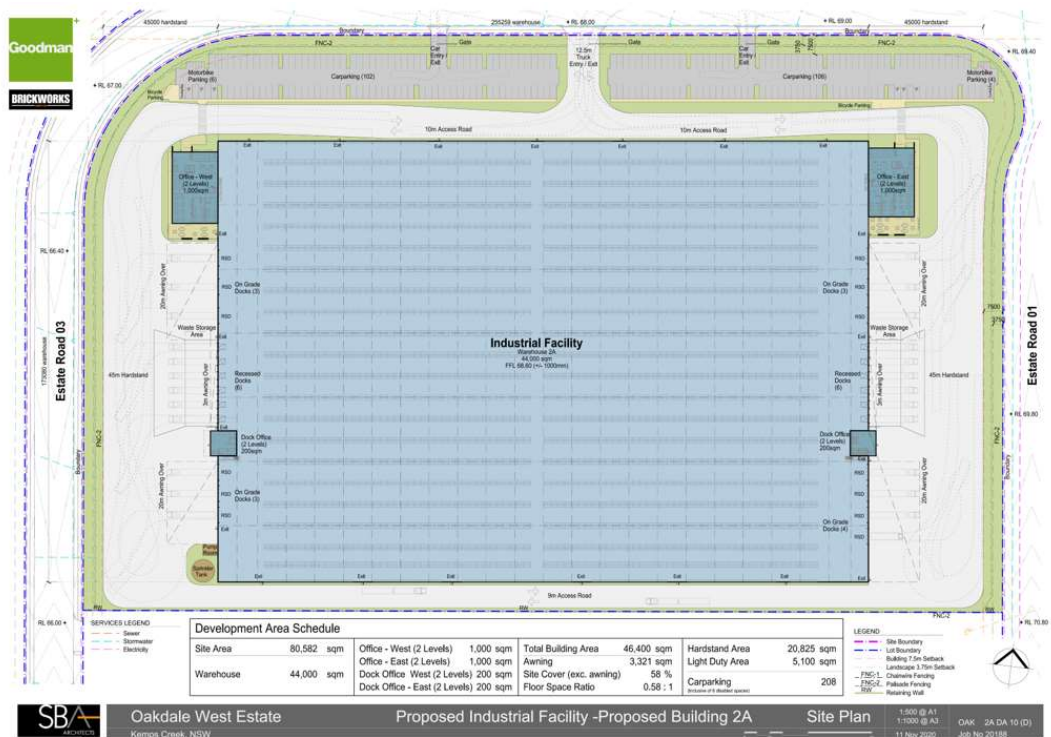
Originally proposed site plan – Building 2A (Source: SBA Architects)
